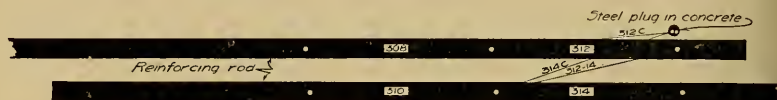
ARRANGEMENT OF GAUGE LINES TO TEST FOR MOVEMENT OF BAR RELATIVE TO CONCRETE.
